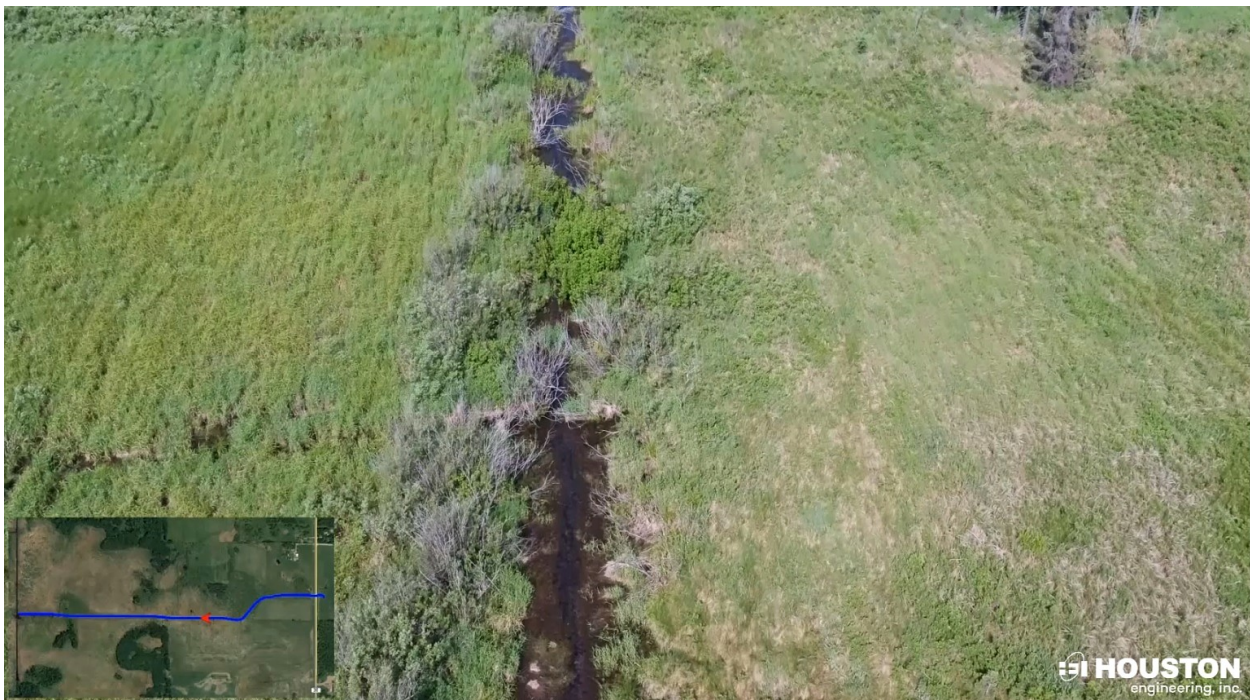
Pooling of water and flow obstruction at Branch 2 STA 33+00.
